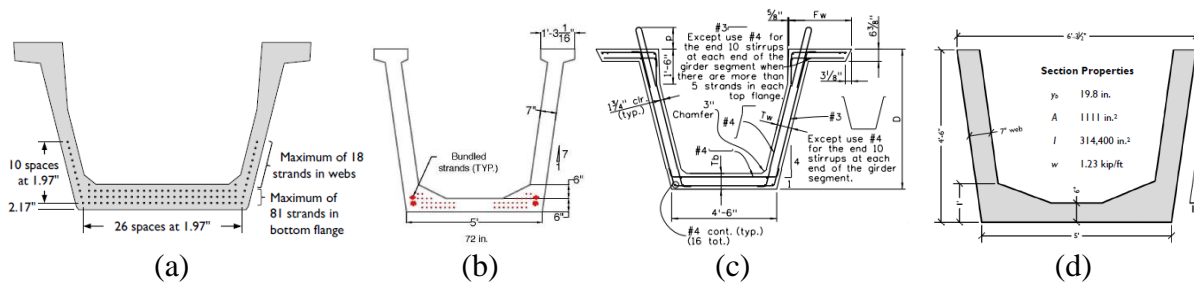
Selected tub girder sections: (a) Texas U54; (b) Washington UF72G5; (c) Colorado B618-U; (d) Washington trapezoidal
